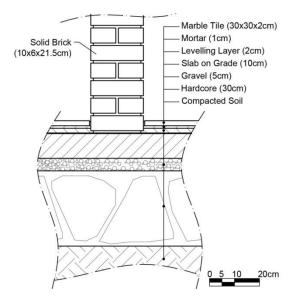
Ground Floor Interior Wall I: Between Office Rooms and Atrium
